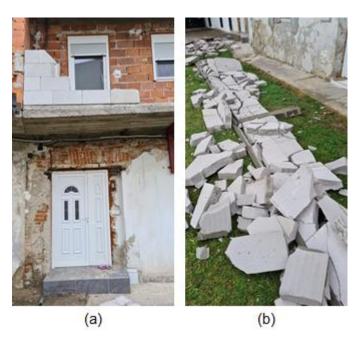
Collapsed unreinforced masonry balcony guardrail (source: Nenad Bijelić and Damir Lazarević).
